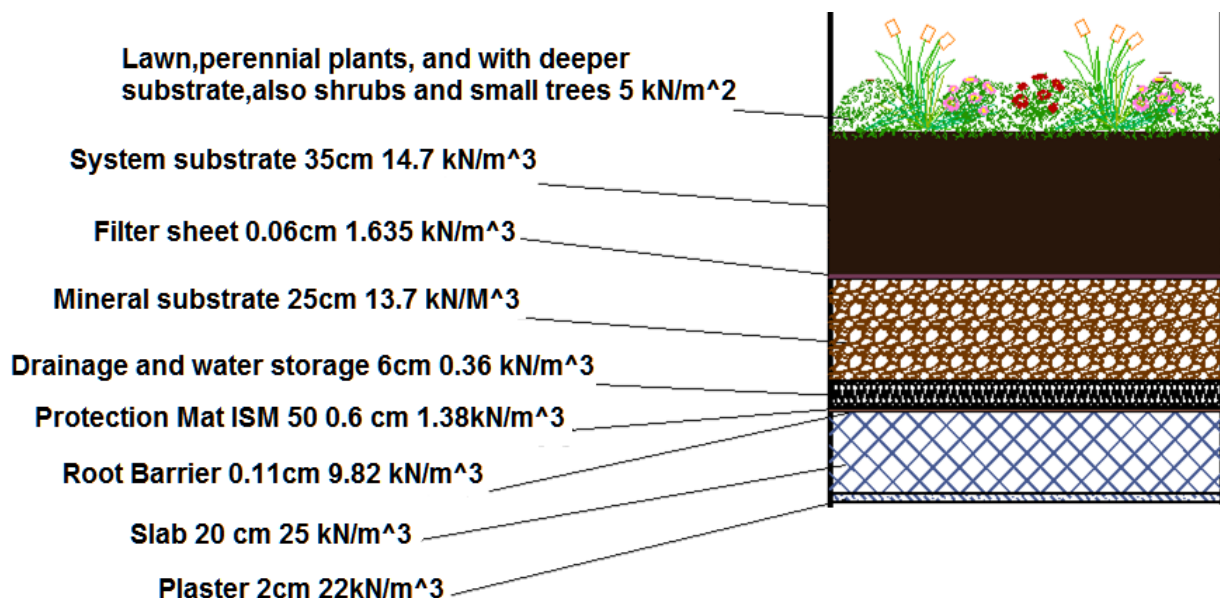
The cross section area for the green roof components of background garden of the building.
